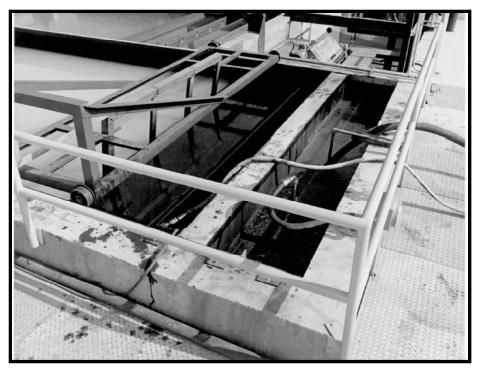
View of southeast corner of new EQ tank in operation (no date). Metal plates are present over pipe trench on the right side.
